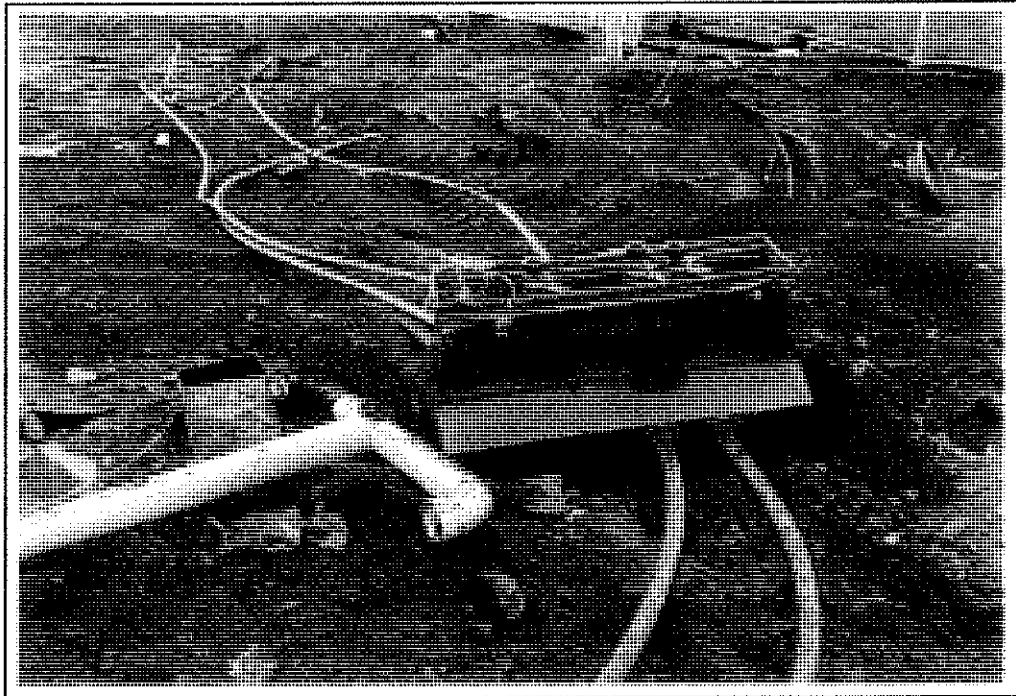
Secondary containment (spill box) beneath northwestern pump dispenser. Green tubing is double-walled, flexible product piping. White PVC is from canopy roof drains.
